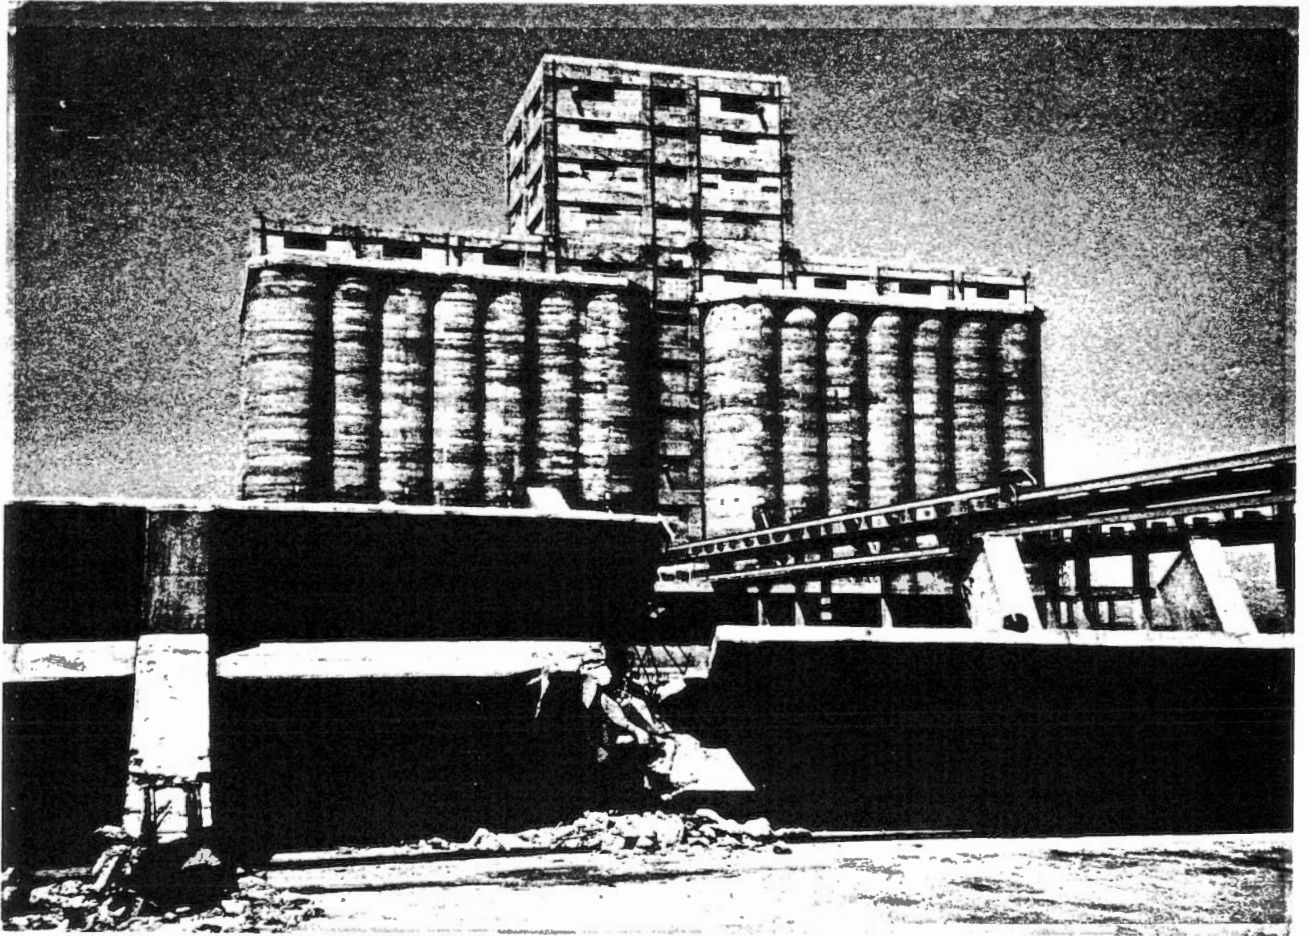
Silo building and conveyor loader structures, port of Lazaro Cardenas. The east-west part of the reinforced concrete conveyor structure (foreground) which ran along the wharf has collapsed, falling to the north, the north-south part was twice as high but was not damaged (centre right). Both of these top-heavy structures were supported by central piers. The east-west structure may have failed because of its orientation or different natural period. Note the 5-storey penthouse, on the 10-storey silo structure, which failed at its base (see detail in Fig. 3.9).
